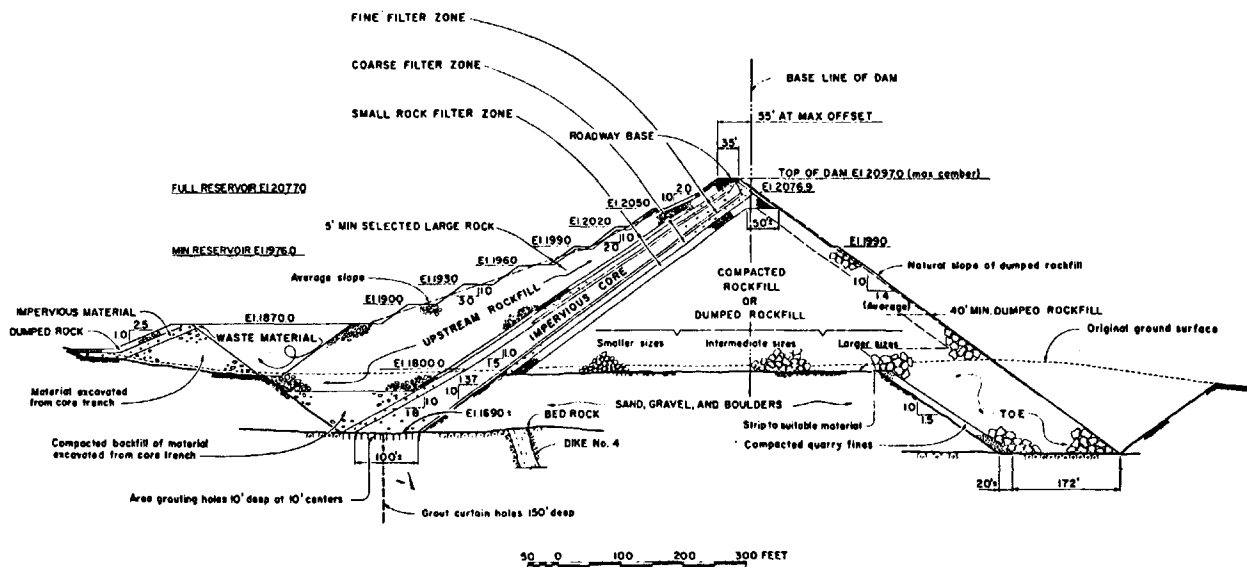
Maximum Section of the Brownlee Project Rock-fill Dam
